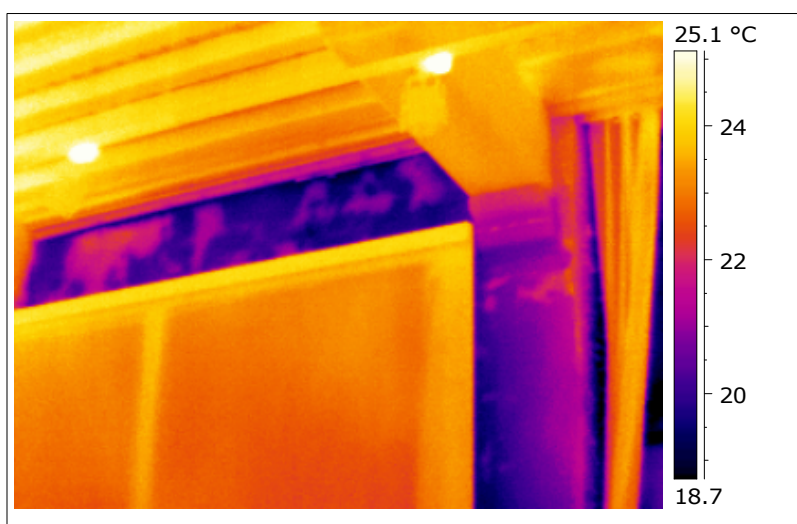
; IRT North-East façade; indoor wall surface damage between the second and the first floor (see table 11 for details)
